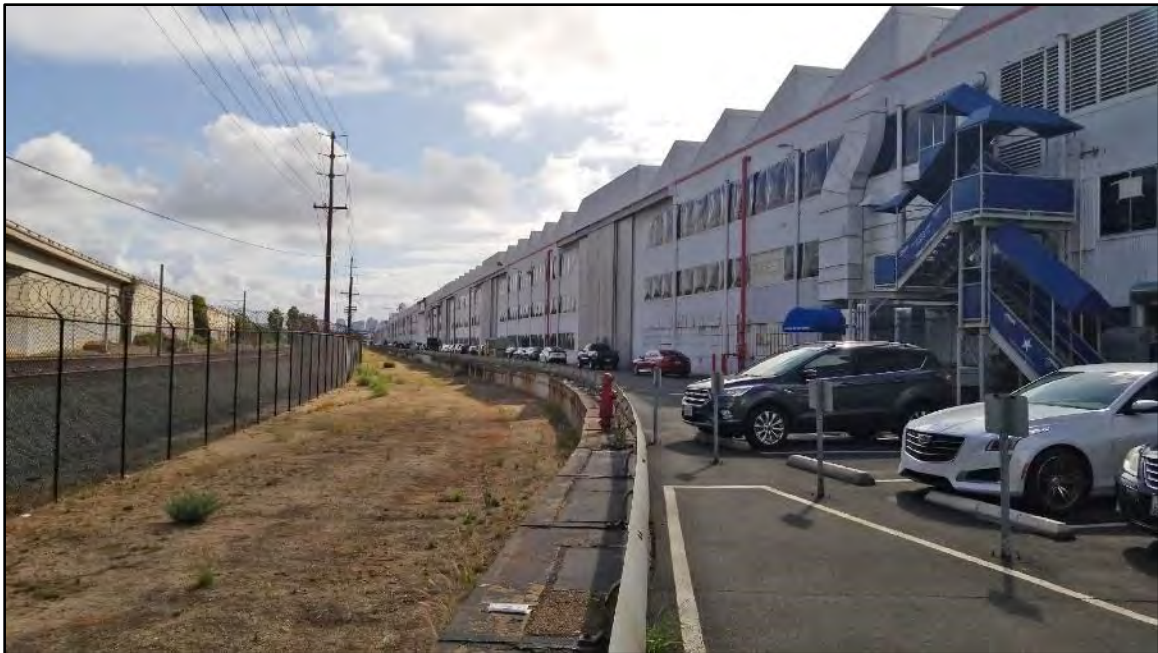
Building 3, the Northeast Façade and Railroad Easement
